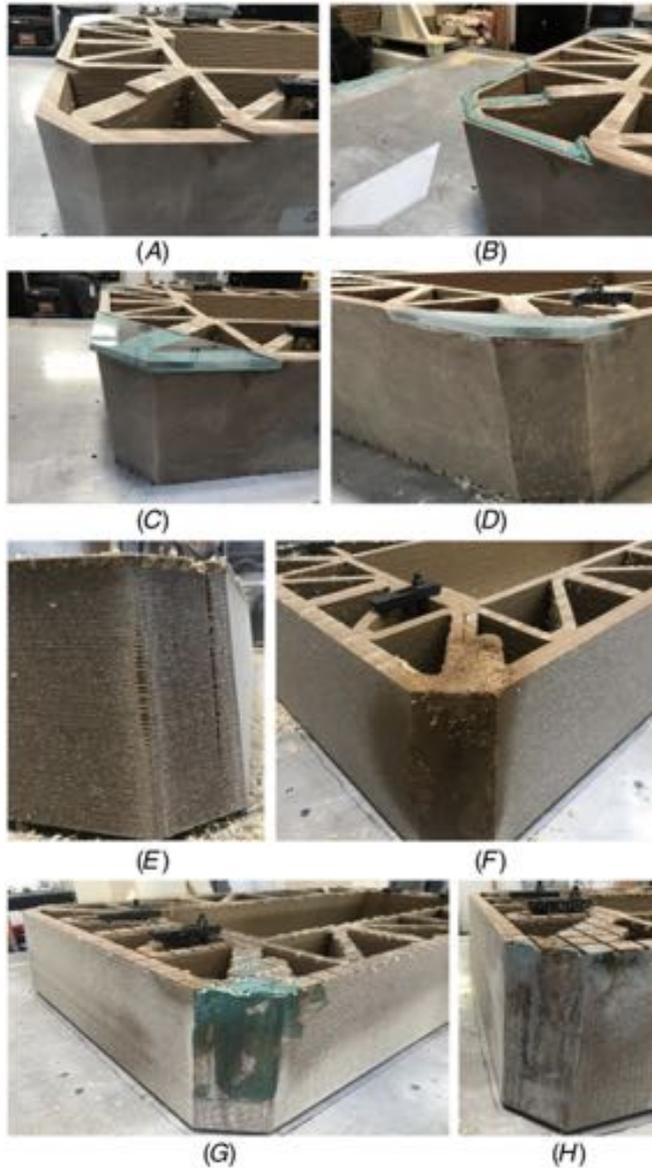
3D-printed WF-PLA and WF-aPLA bottom forms. (A) Near-net shape 3D-printed WF-PLA bottom form. (B) Warpage of bottom forms (WF-PLA). (C) Warpage measurement (WF-PLA). (D) Bottom form with I-beam level (WF-aPLA). (E) Collapse of thick walls (WF-aPLA).
